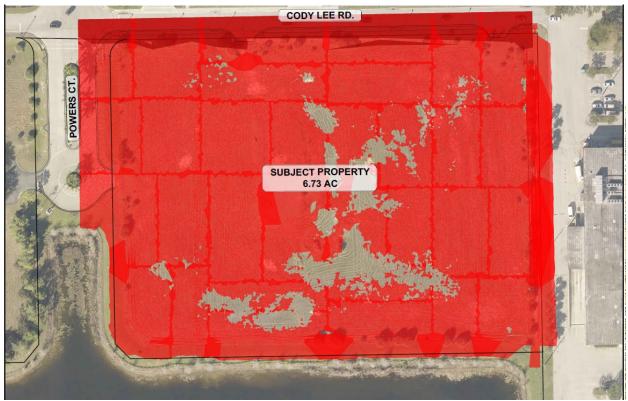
Areas on Southeast Parcel where Current Elevation Exceeds Control Elevation
